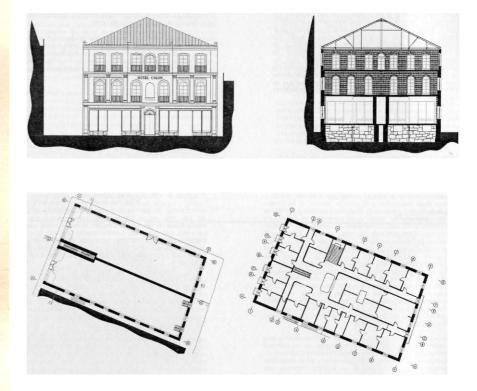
Hotel Colon. Built before 1872; masonry structure; hotel and comercial use.(Print: Tornero, R. 1872; Drawing: Jiménez, C. 2007)
